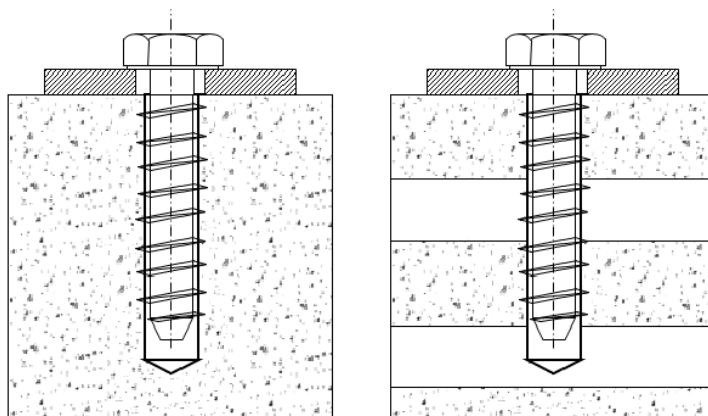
Screw anchor intended to be used in solid and hollow masonry
